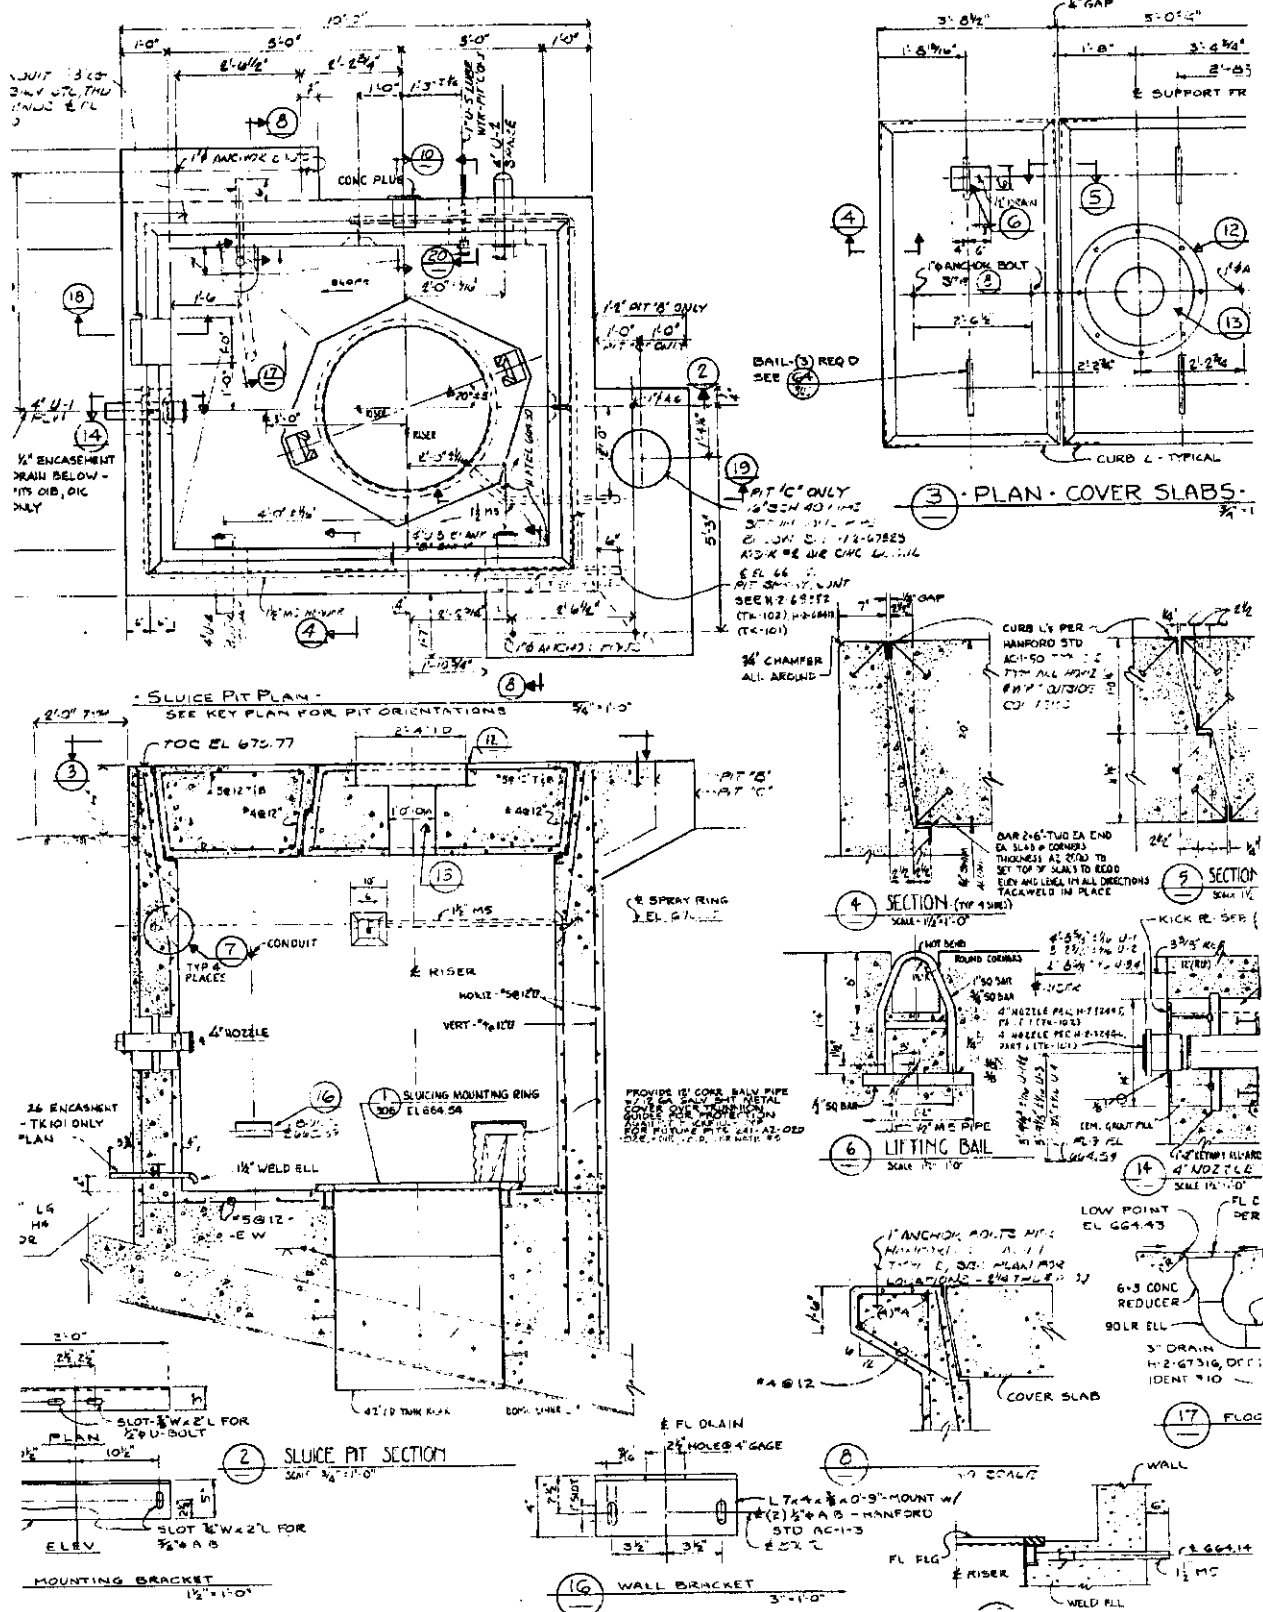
Structural Concrete Sluicing Pit Plans - Part 2 of 2.
